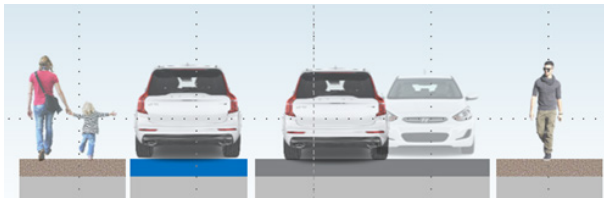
Cremorne Street – proposed future layout (indicative only)
